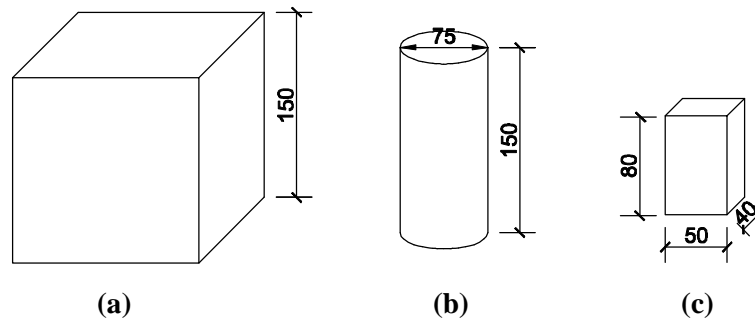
Geometry of the distinct specimens (dimensions are in mm); (a) cubic specimens; (b) cylindrical specimens; (c) prismatic specimens
